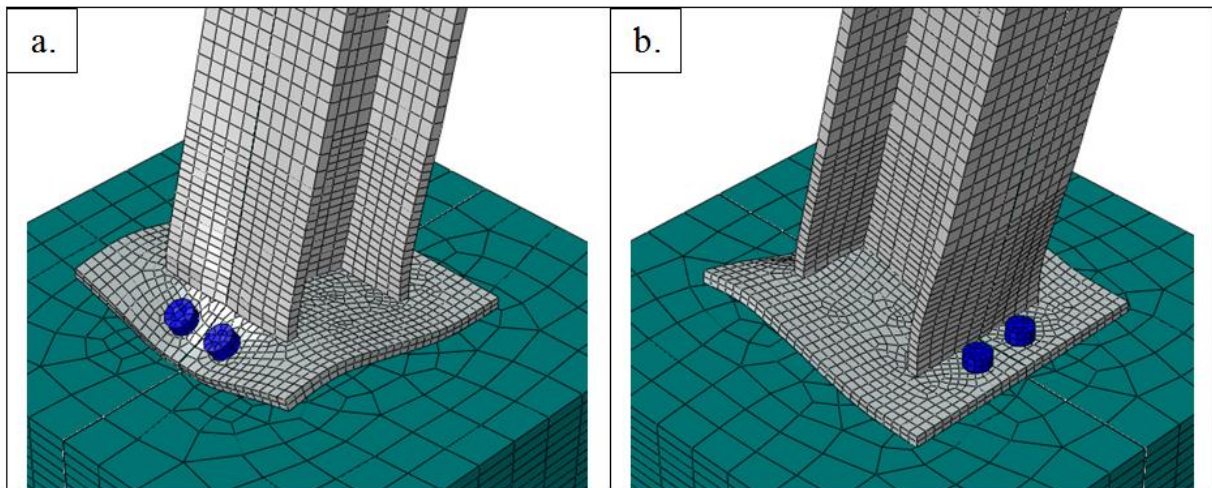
Deformation of model 1. a) Tensile flange, b) Compressive flange
